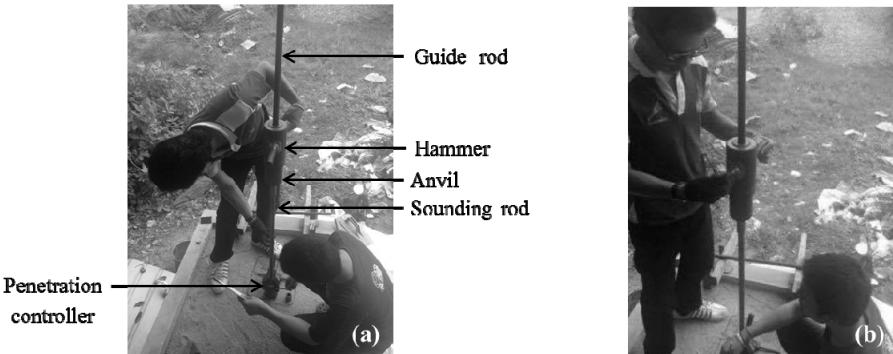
The lightweight penetration test (a) Assemble the equipment (b) Perform testing
